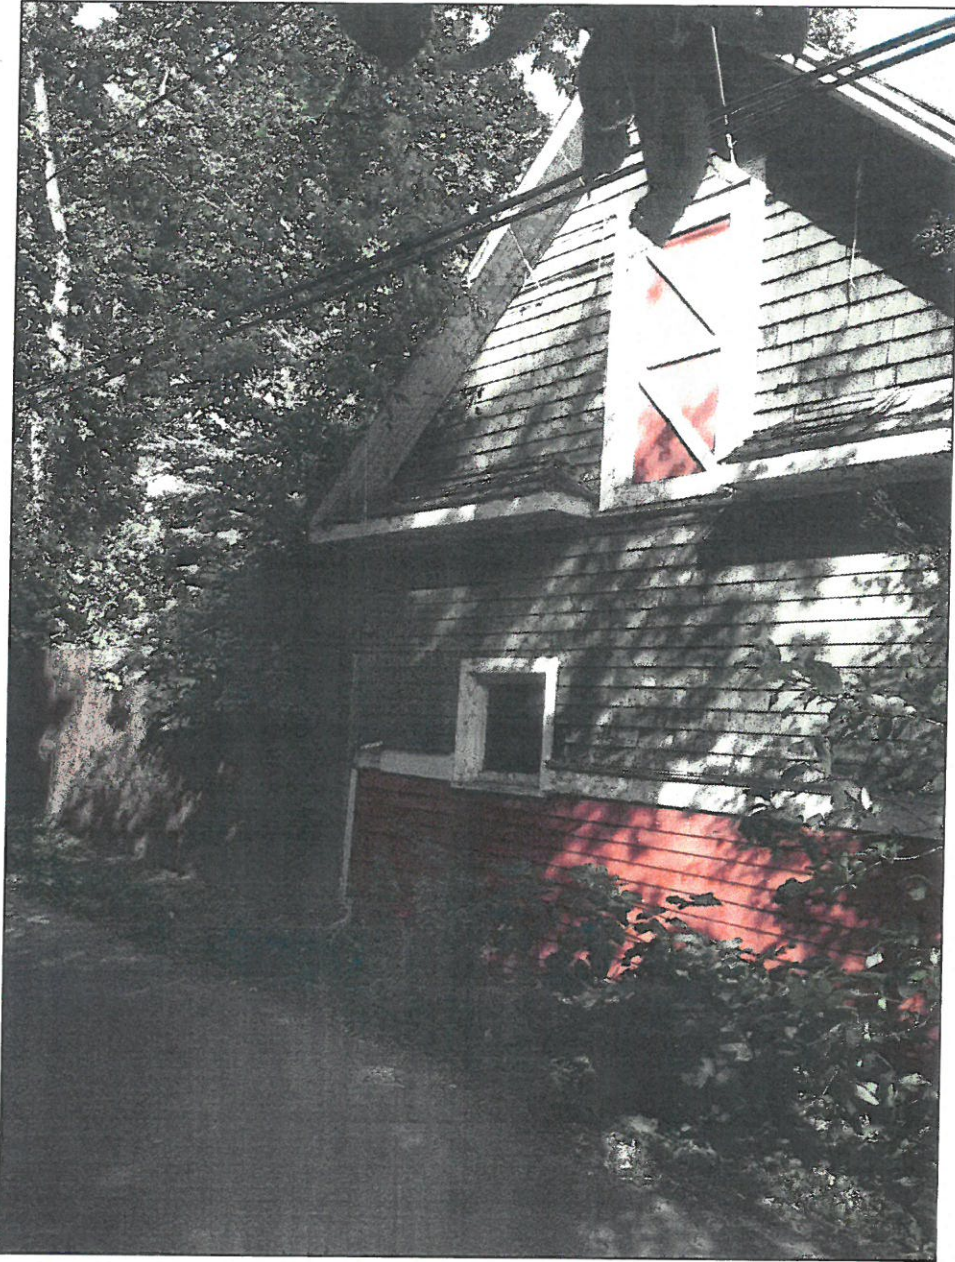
The west view of the carriage house. The condition of the west wall siding and shingles is not as good as the east side. Some replacement of both may be necessary. The lower window accesses the feed storage area. The upper door enters a forage storage area. This door is thought to be original and will serve as the model for reconstruction and replacement of all other exterior doors. Some wood trim is missing.
